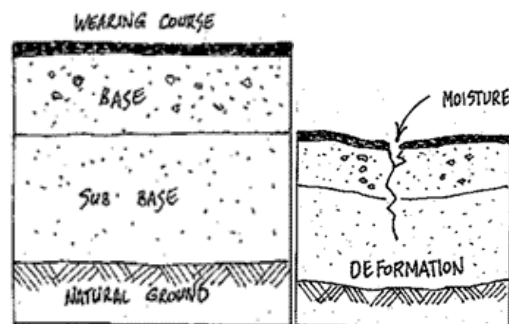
Example of a Road Pavement in Good Condition and a Road Pavement in Poor Condition (Source: www.roads.act.gov.au)
